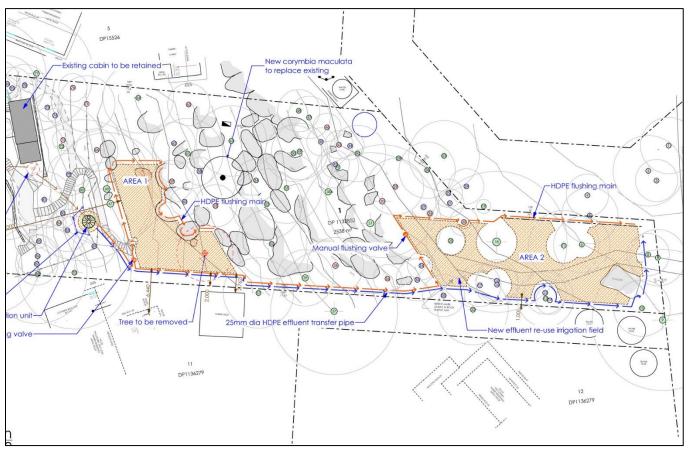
Figure A: Excerpt from the Wastewater System Site Plan showing the area of proposed works.
